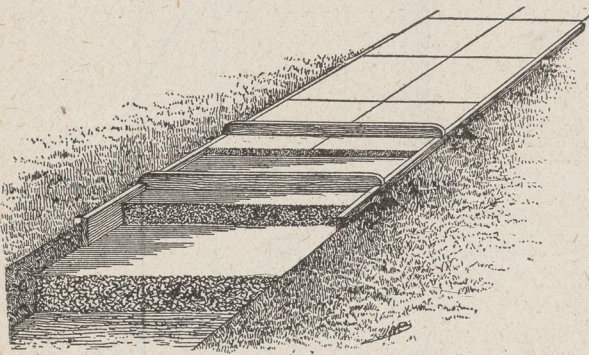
DETAILS OF CONCRETE WALK CONSTRUCTION.
